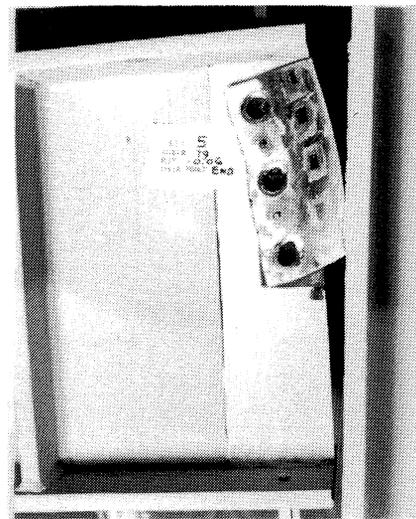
Failure of Welds and Bolts in Specimen 5
